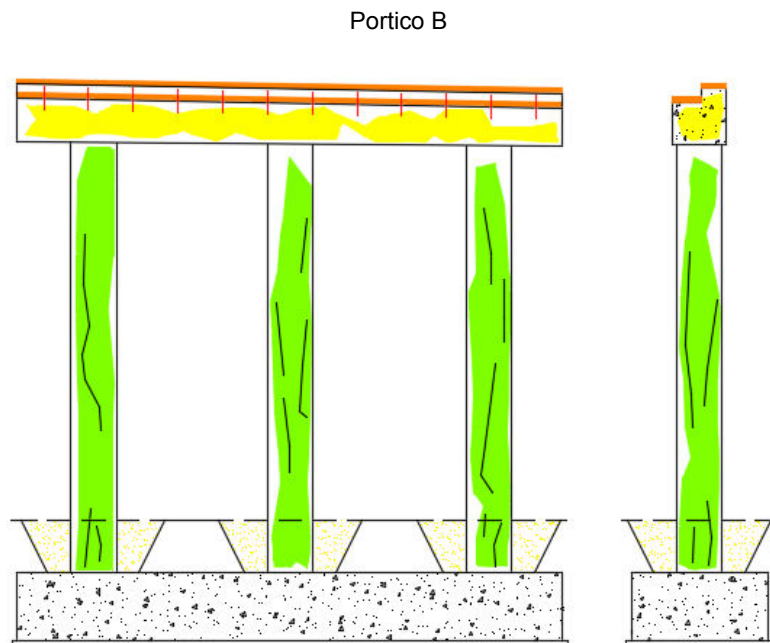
Vulnerable zones – main truss (Orange= Debris accumulation on abutment, Yellow= Moisture in the pier cap, concrete detachments and visible armor and Green = External cracks, concrete detachments and visible armor)
